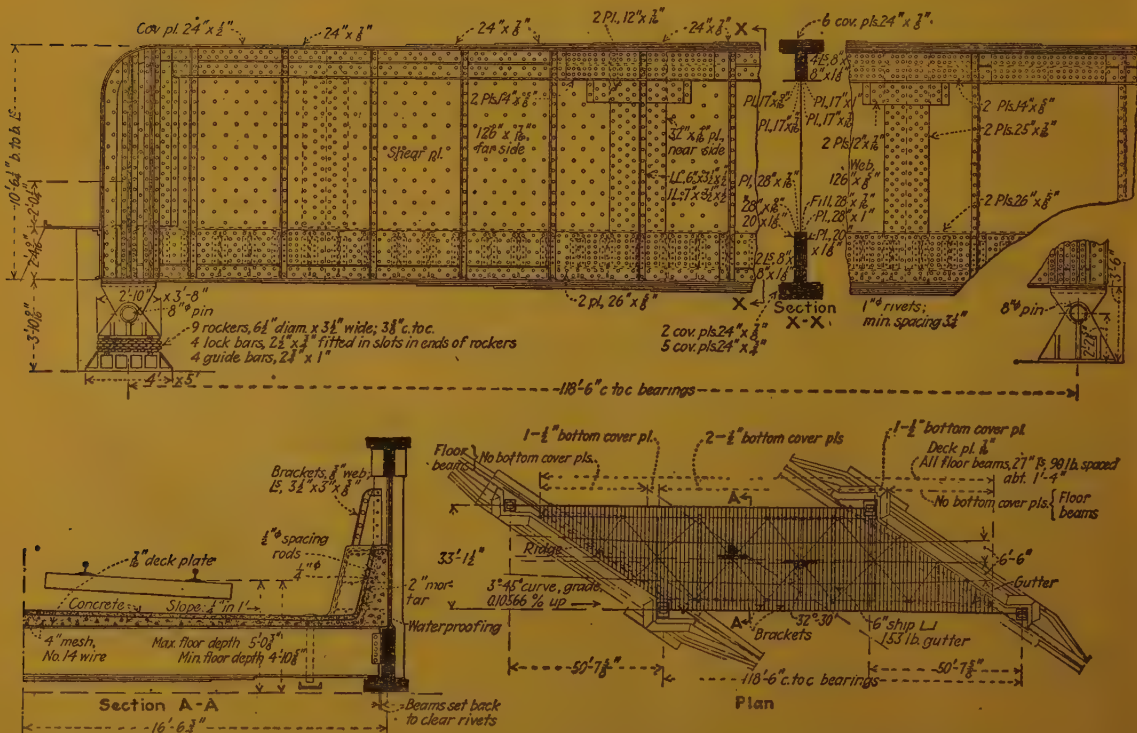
Girder construction web has reinforcing plate at one end to take the heavy shear.
